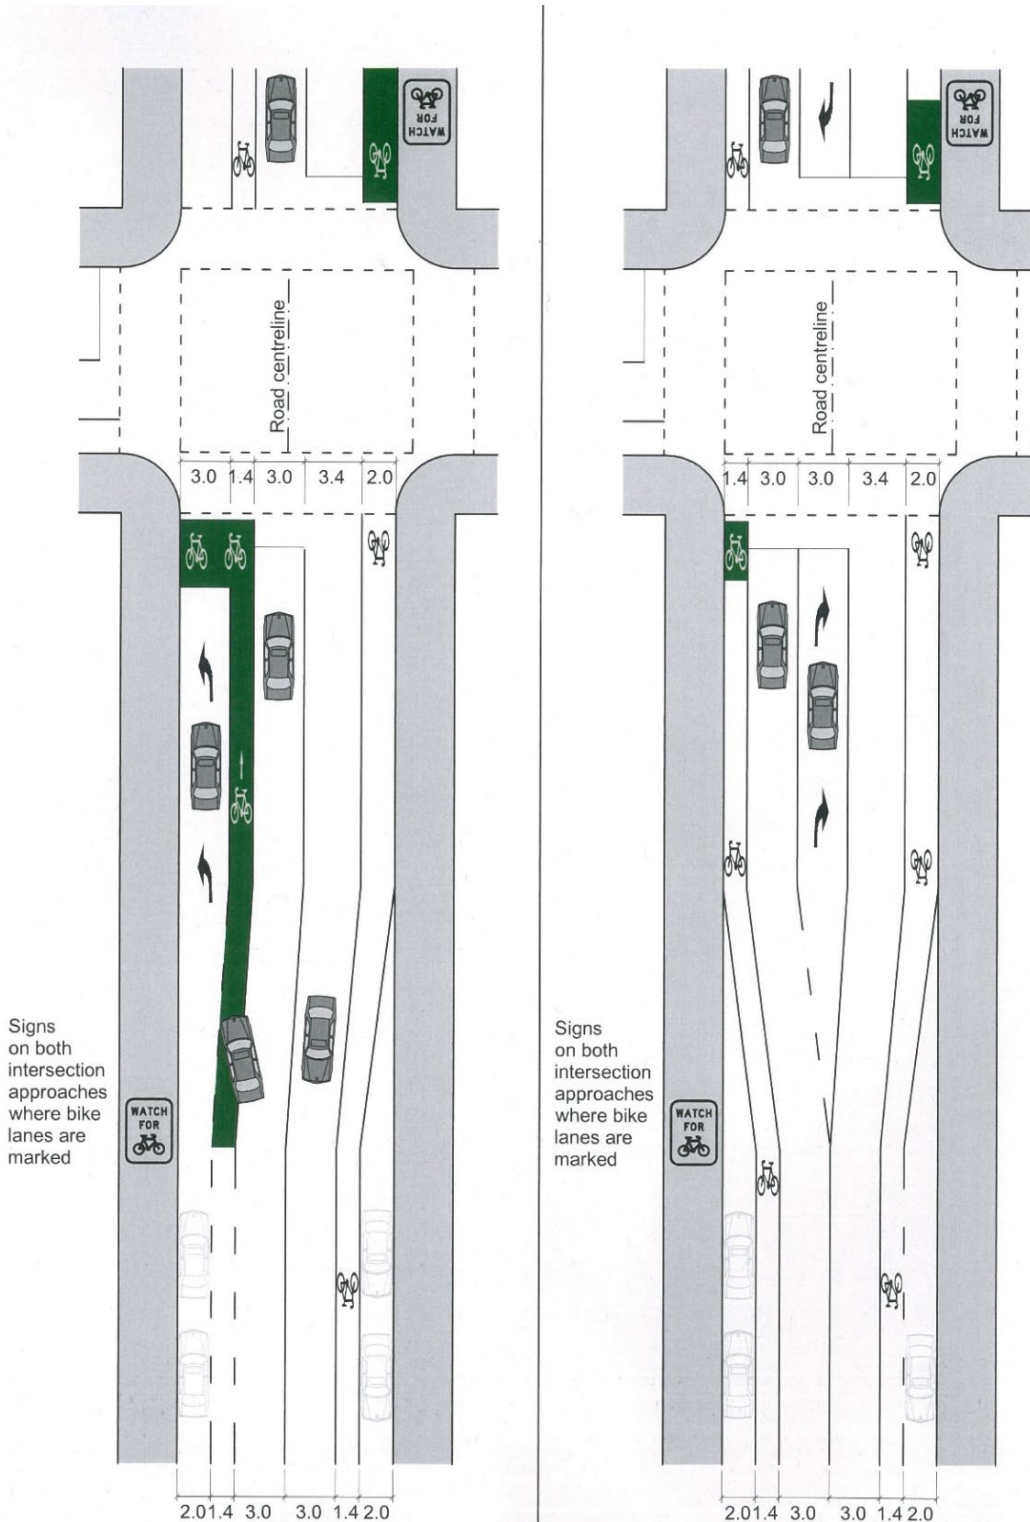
Design options for signalised intersections (waiting, through and departure)
